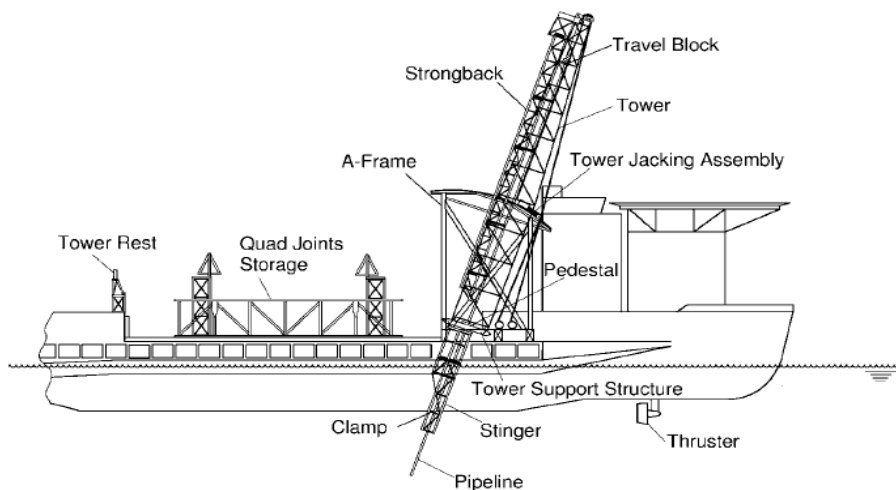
Schematic drawing of the DP 50 and its J-lay tower
